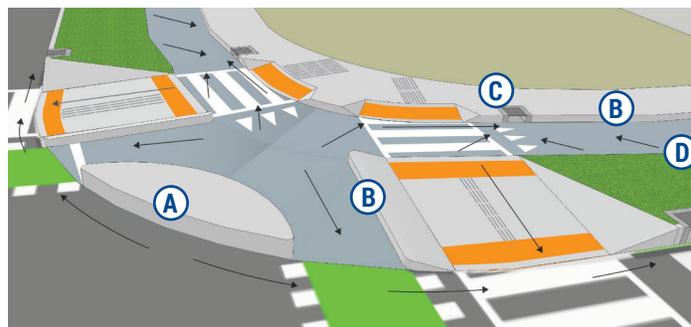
Standard protected corner showing relative curb heights and arrows showing direction of drainage
